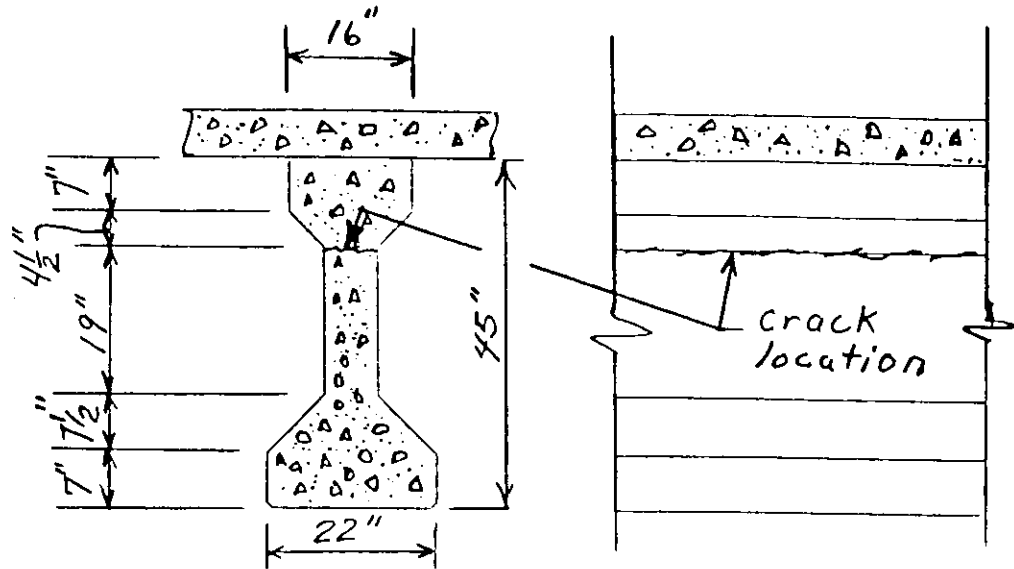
AASHTO TYPE III Girder With Crack Location.
